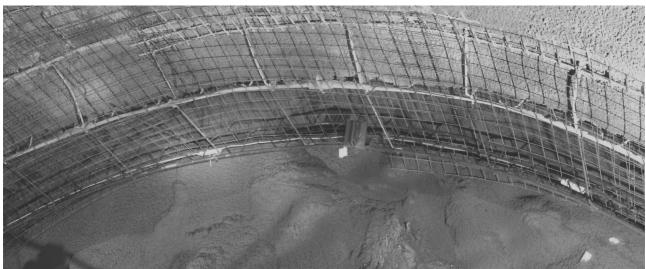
Illustration of a steel shotcrete lining (Photo O. Jandejsek)
